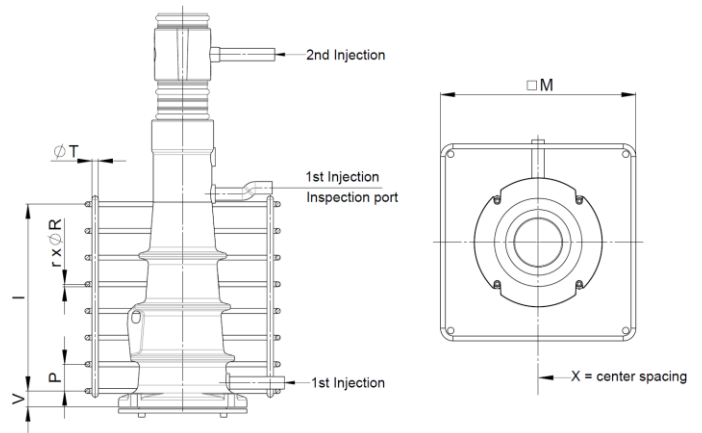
Local anchorage zone reinforcement type AF @ 32/40 MPa
